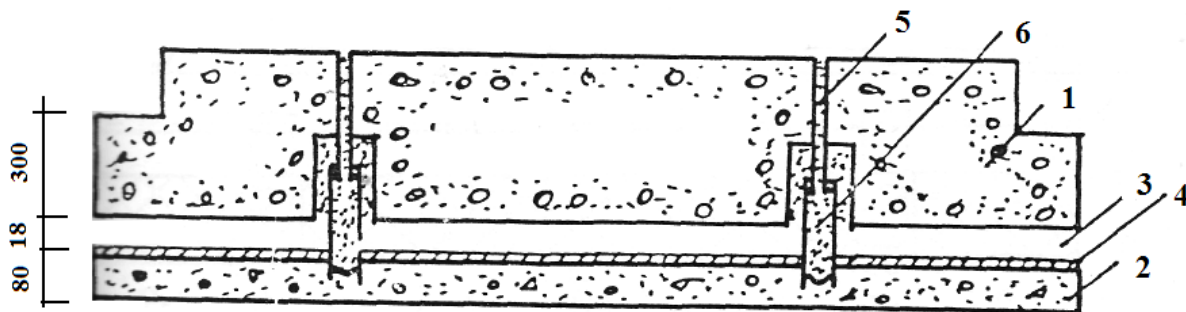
Fastening a reinforced concrete screen to the main part of the outer wall panel of a 5-storey residential building in Batumi: 1-main part of the lightweight concrete panel; 2-screen made of reinforced concrete; 3-air gap; 4-window unit
